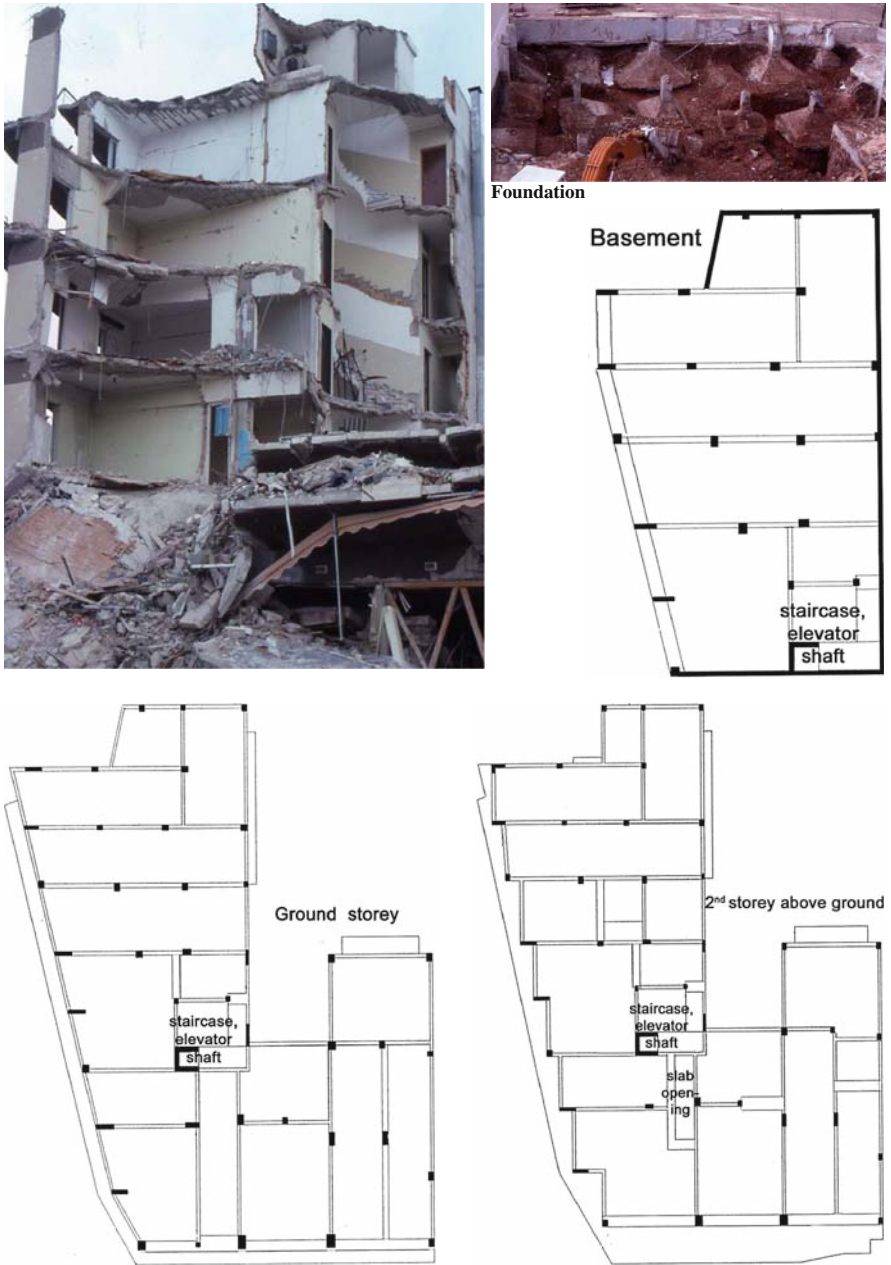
Framing plans of collapsed apartment building in Aegio (GR) and pictures after removal of debris
